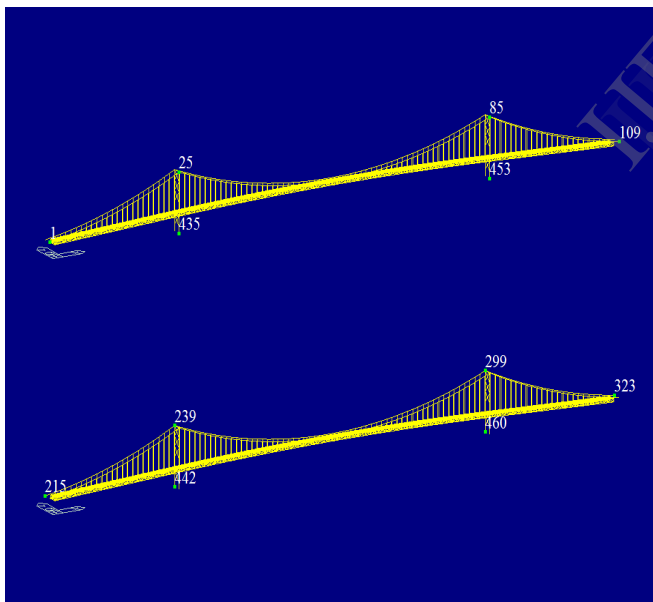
3D view and node number of support conditions of the proposed long-span suspension bridge with external anchorage system
